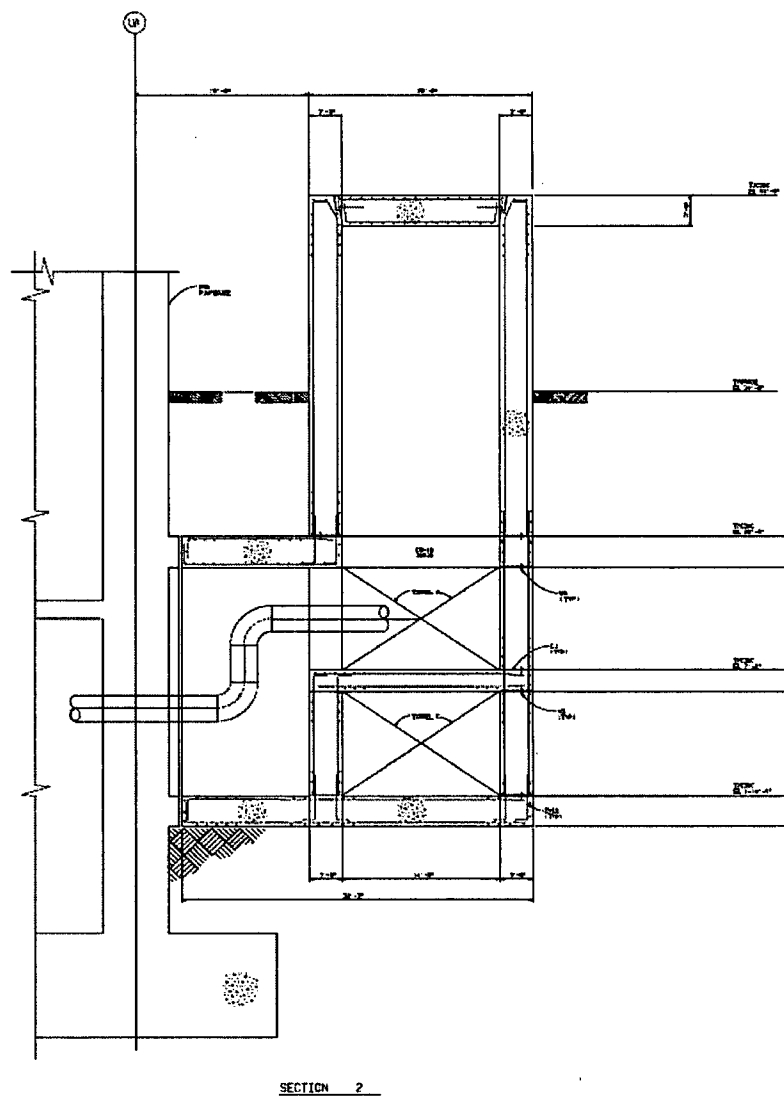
S1.270: RSW Piping Tunnel Section
